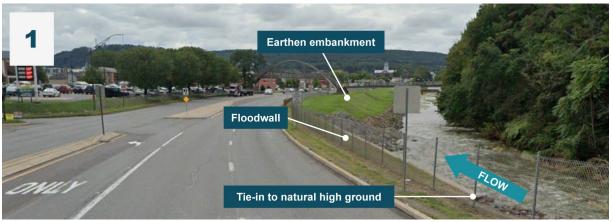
Example of Floodwall and Tie-in to High Ground
